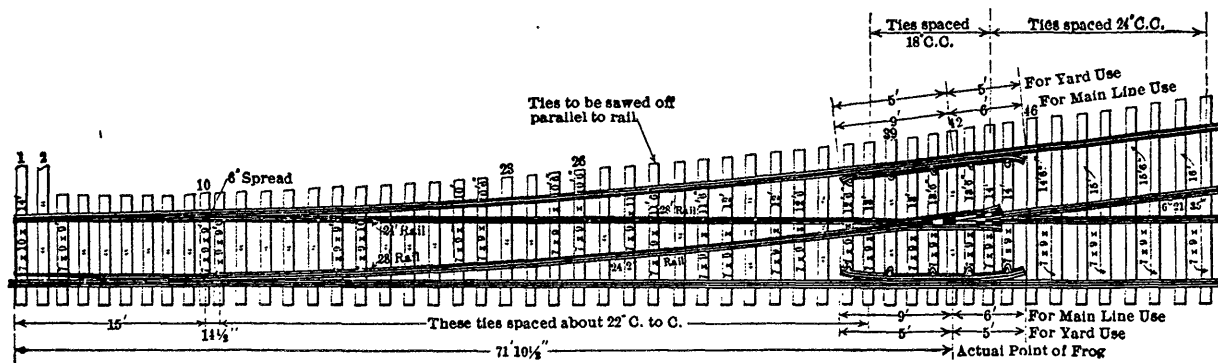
Typical rail and tie layout, with turnout, from Orrock
